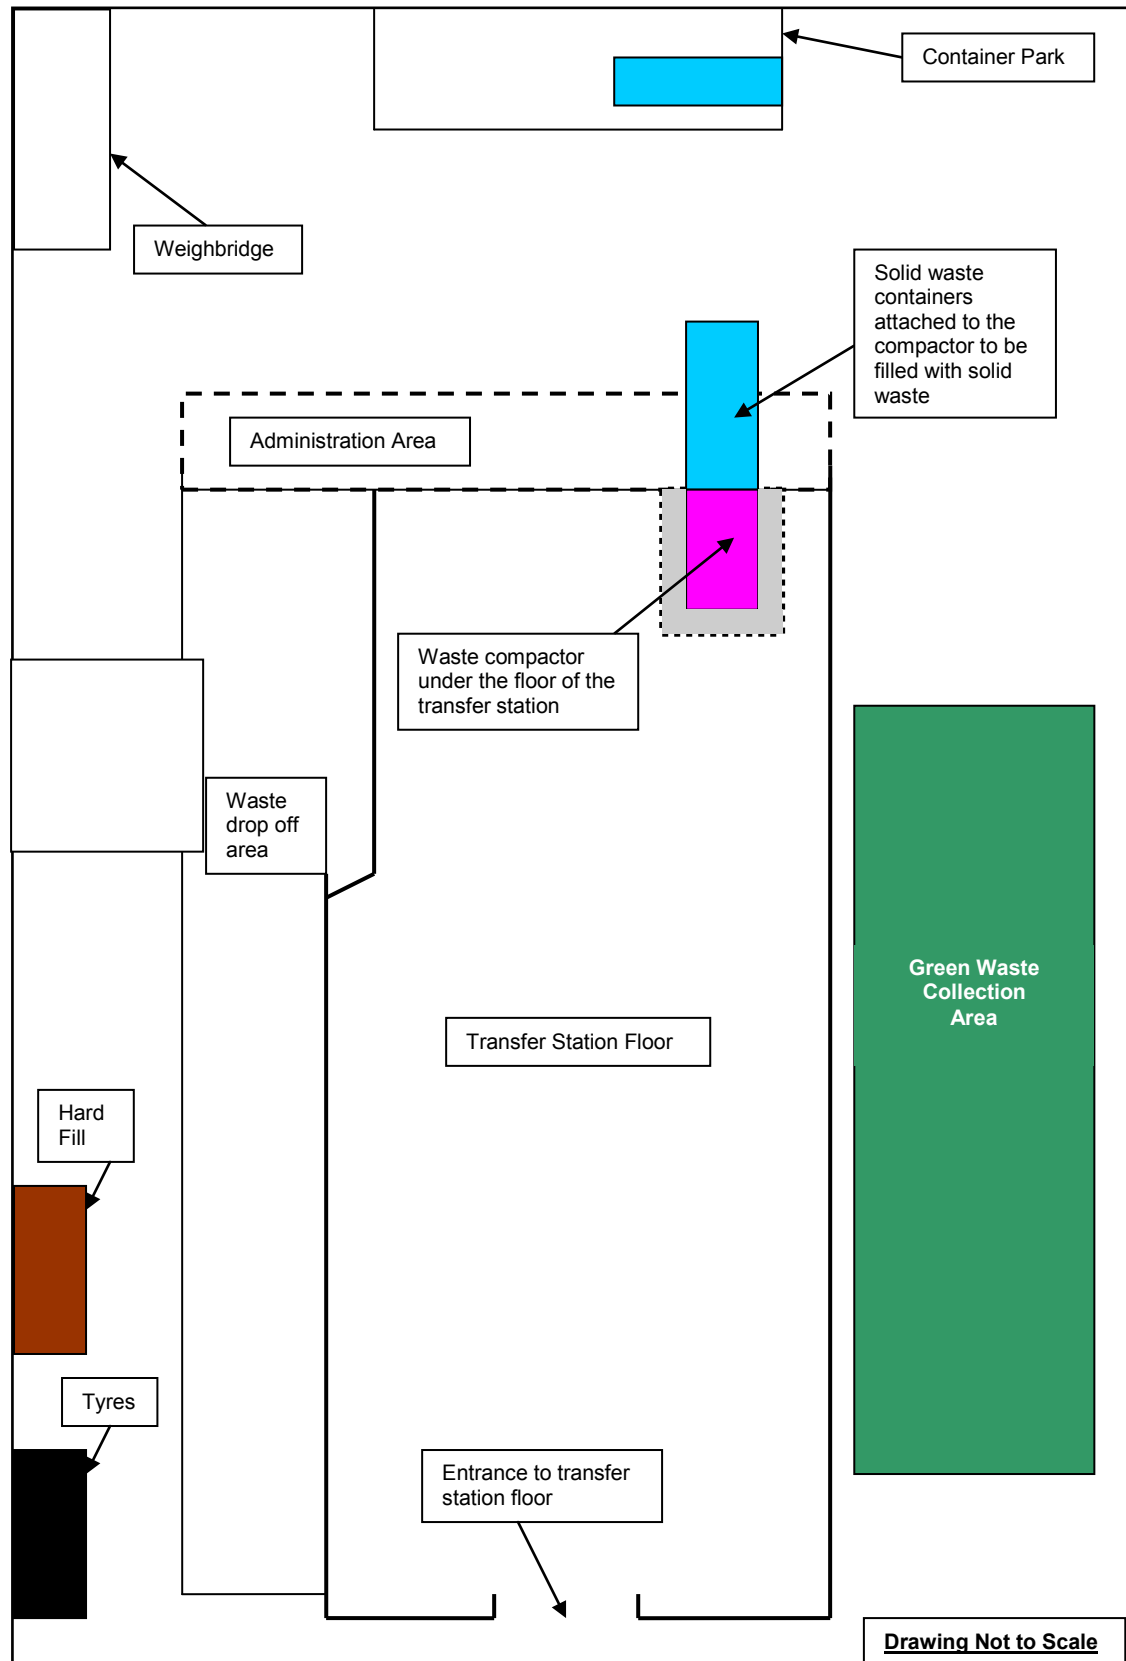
Existing Transfer Station Layout at Styx Mill (Author, 2005)
